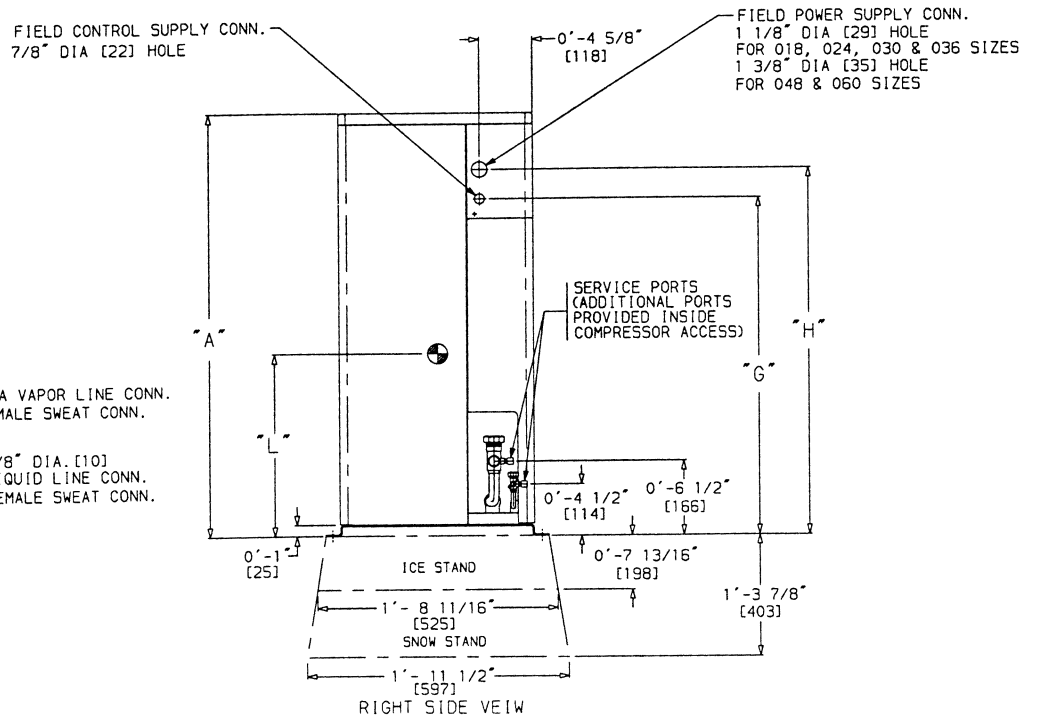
38HDL018-060 — Dimensional Drawing
